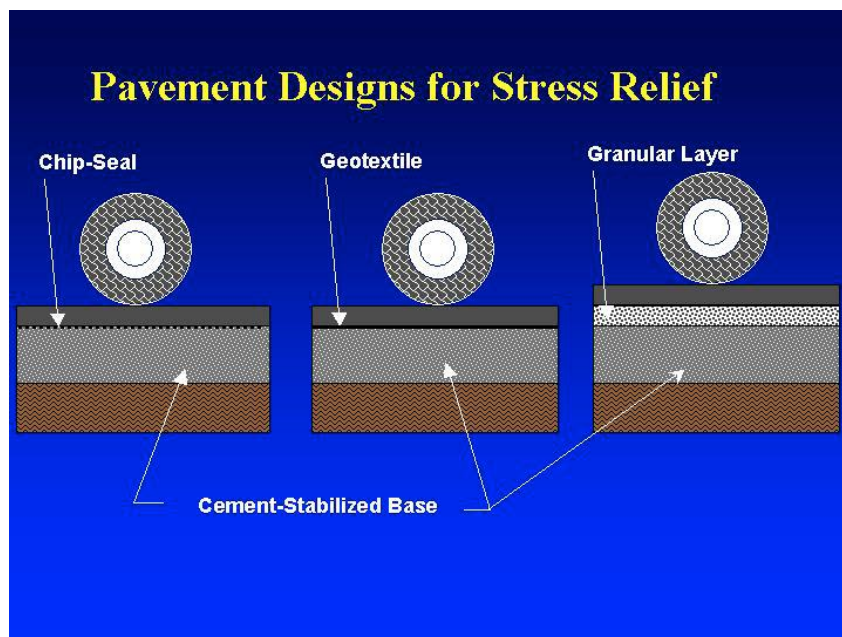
Pavement designs for stress relief to minimize shrinkage cracking reflection (Adaska and Luhr, 2004)
